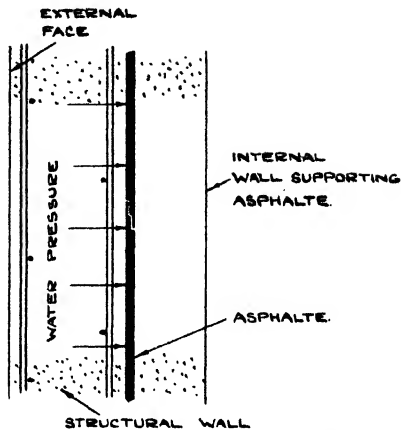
PROVISION OF INSIDE WALL SUPPORTING ASPHALTE AGAINST WATER PRESSURE
